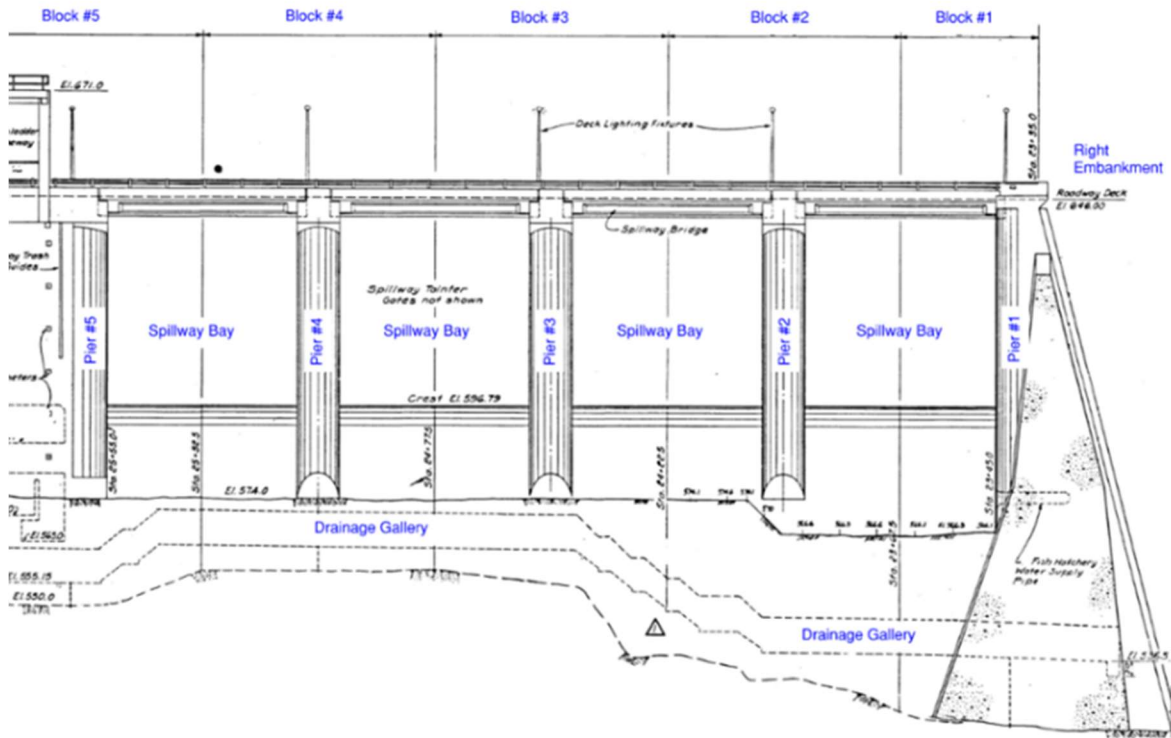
Concrete spillway components of dam looking downstream. Adapted from USACE, 1964.
